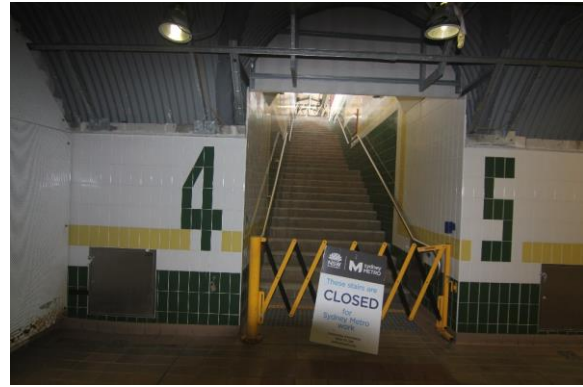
View of south tunnel looking towards platform 4/5.<sup>362</sup>
